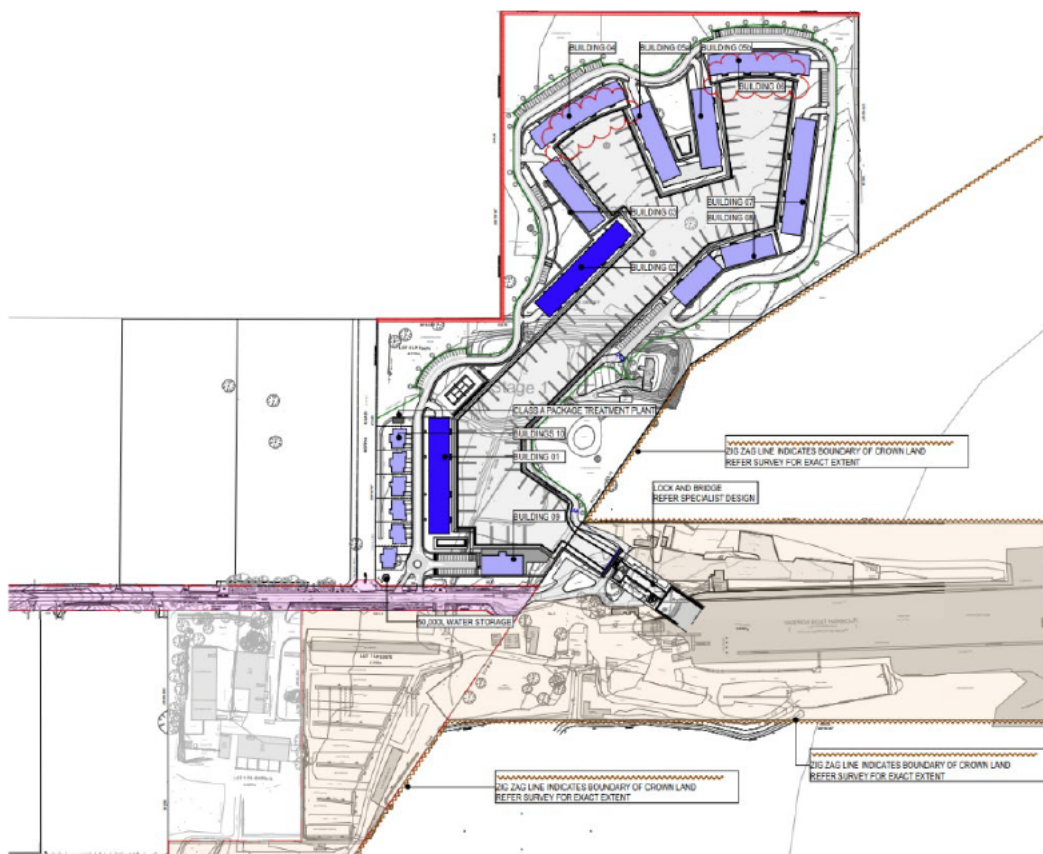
The endorsed staging plan for CP09/002 showing the layout of the proposed extension of the Yaringa Boat Harbour on the northern side of Lumeah Road. Works approved at 1 and 3 Lumeah under CP09/002 are not shown in this staging plan.
